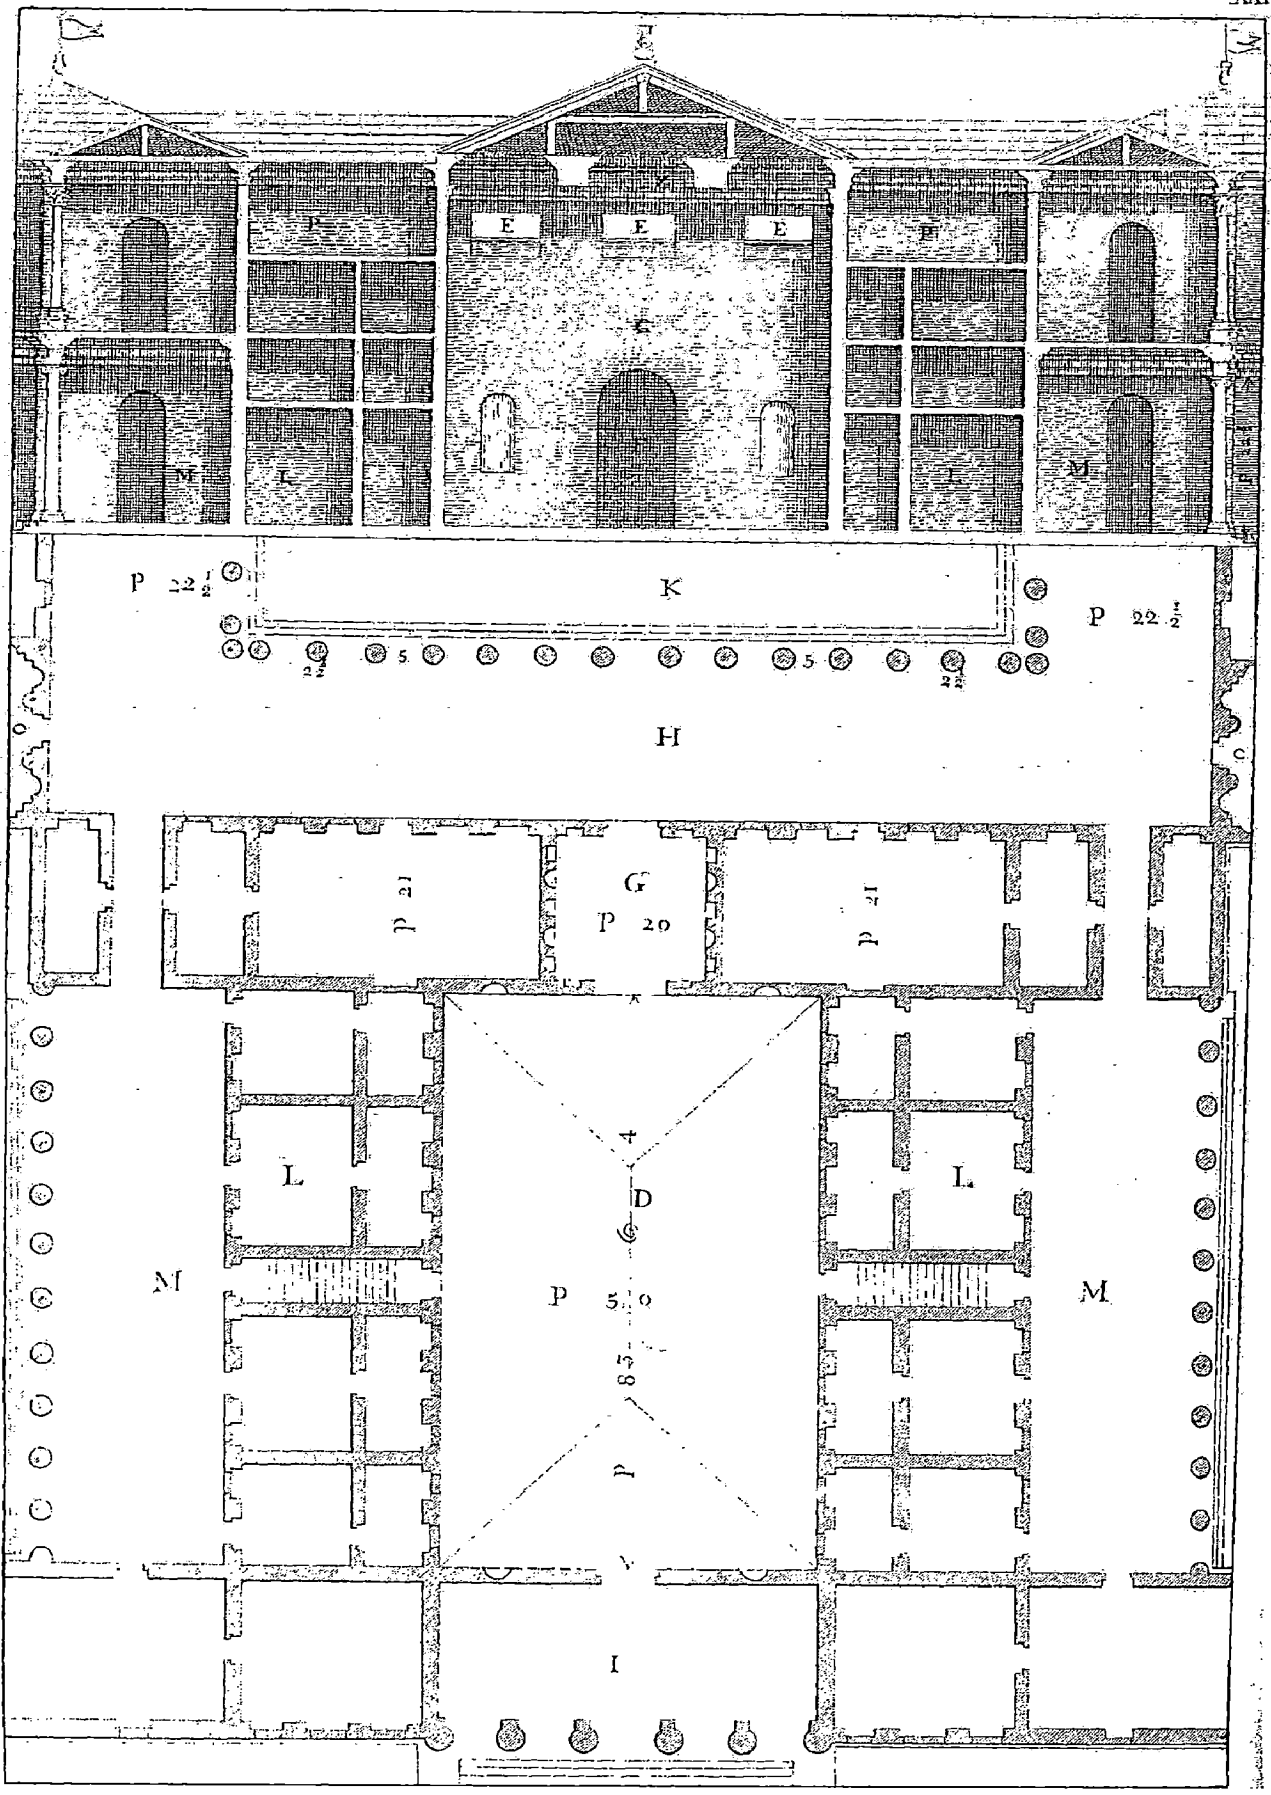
Testugginato Atrium A private house of the ancient Romans in plan and section
